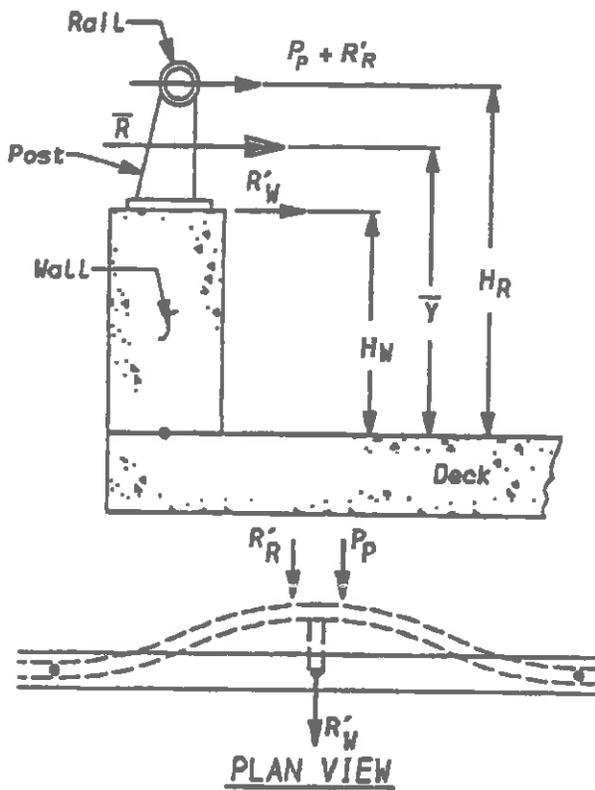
Concrete Wall and Metal Rail Evaluation—Impact at Post
